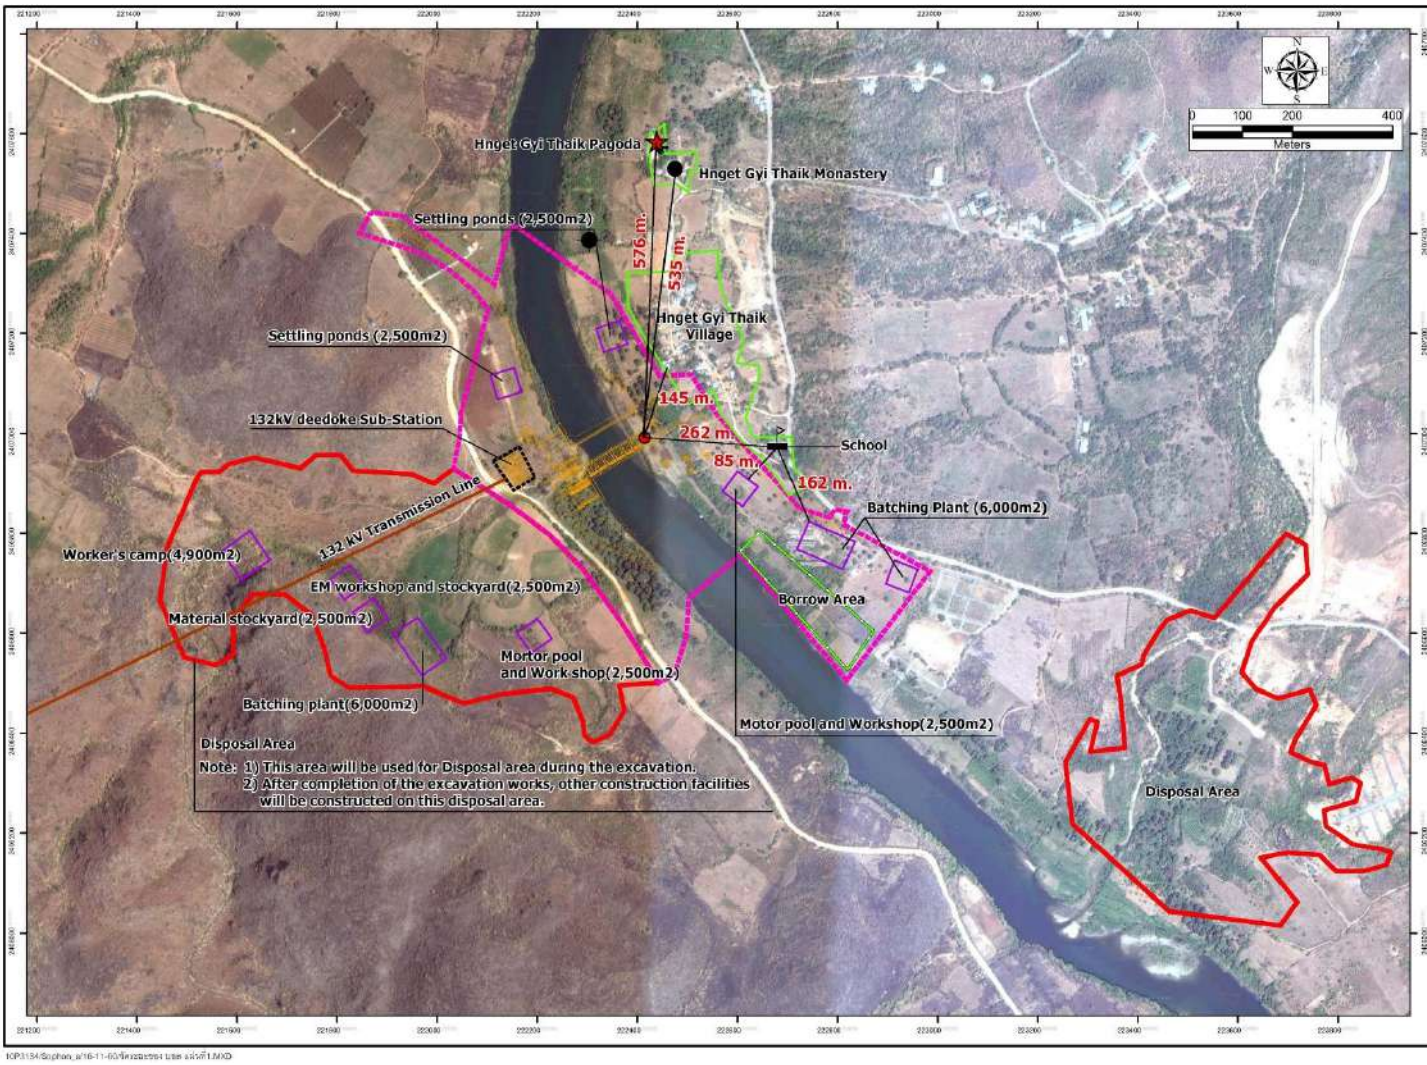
THE DISTANCE BETWEEN THE PROJECT CONSTRUCTION SITE AND RELIGIOUS PLACE CLOSED TO PROJECT CONSTRUCTION SITE
